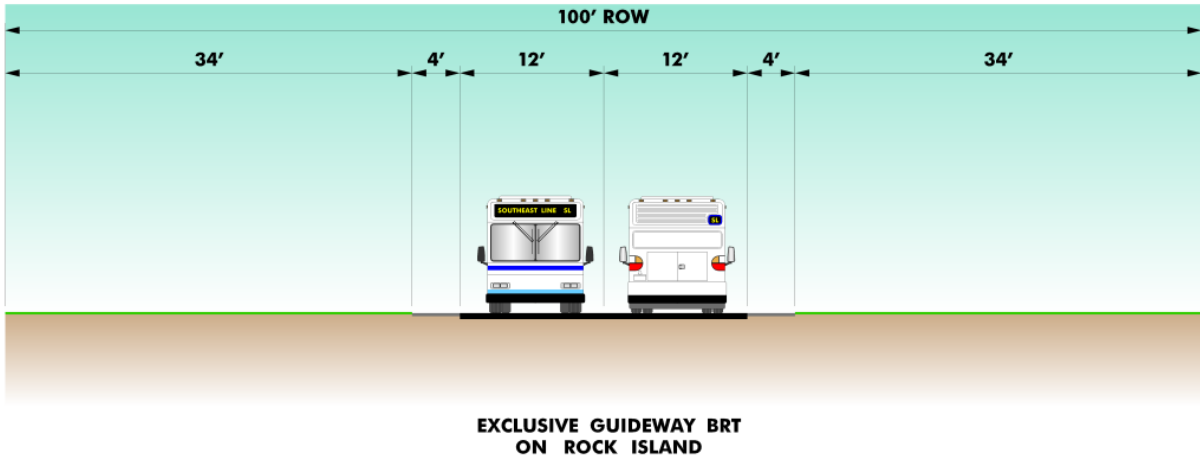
Bus Rapid Transit Rock Island Railroad Typical Section
